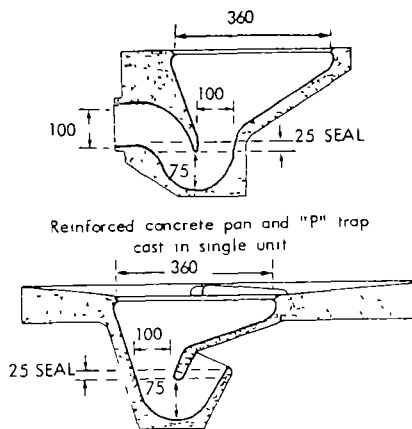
Alternative types of pour-flush latrine pan. The lower version is designed to replace the floor slab of a pit latrine, so as to give it a water seal.
